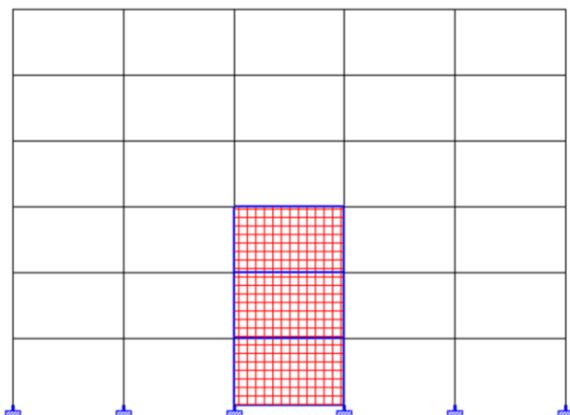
Model 9 – Shear Wall up to 3rd Floor
